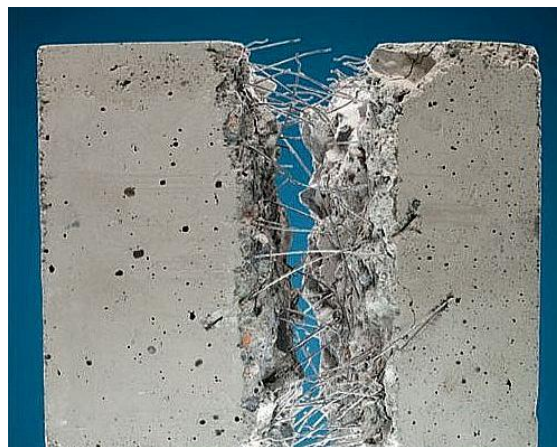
Schematic presentation of steel fibre reinforced in concrete mix
